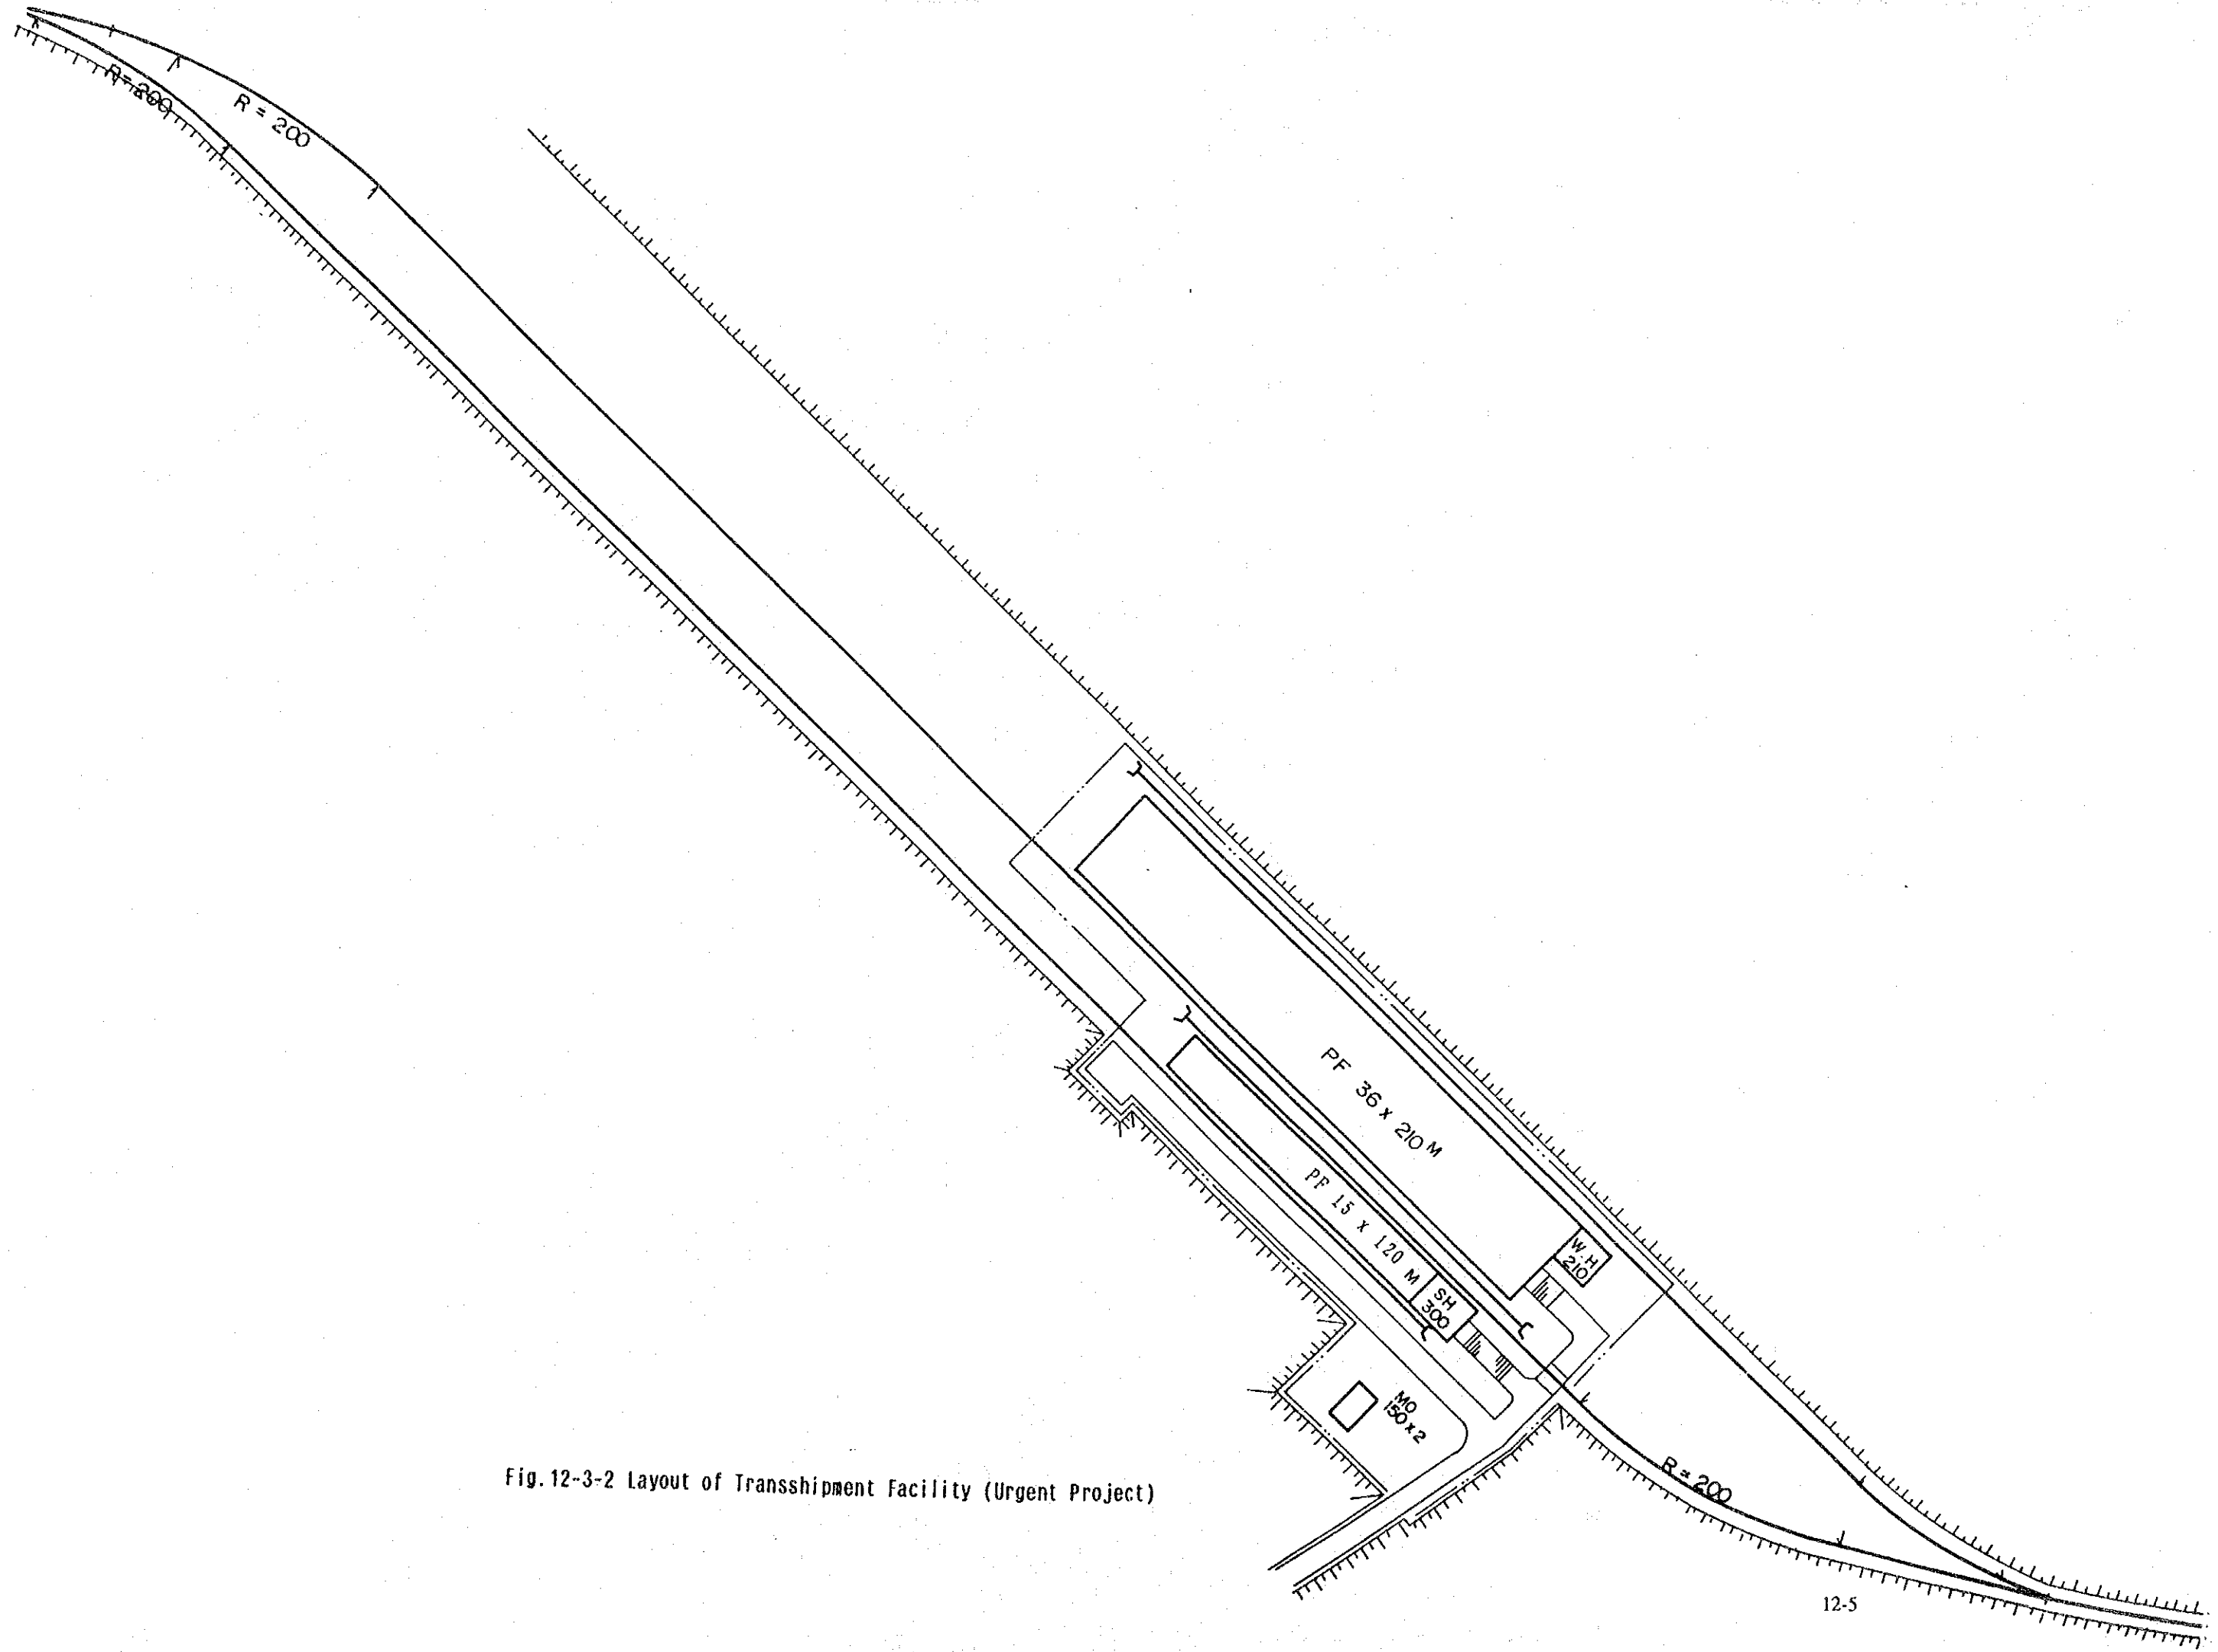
Layout of Transshipment Facility (Urgent Project)
